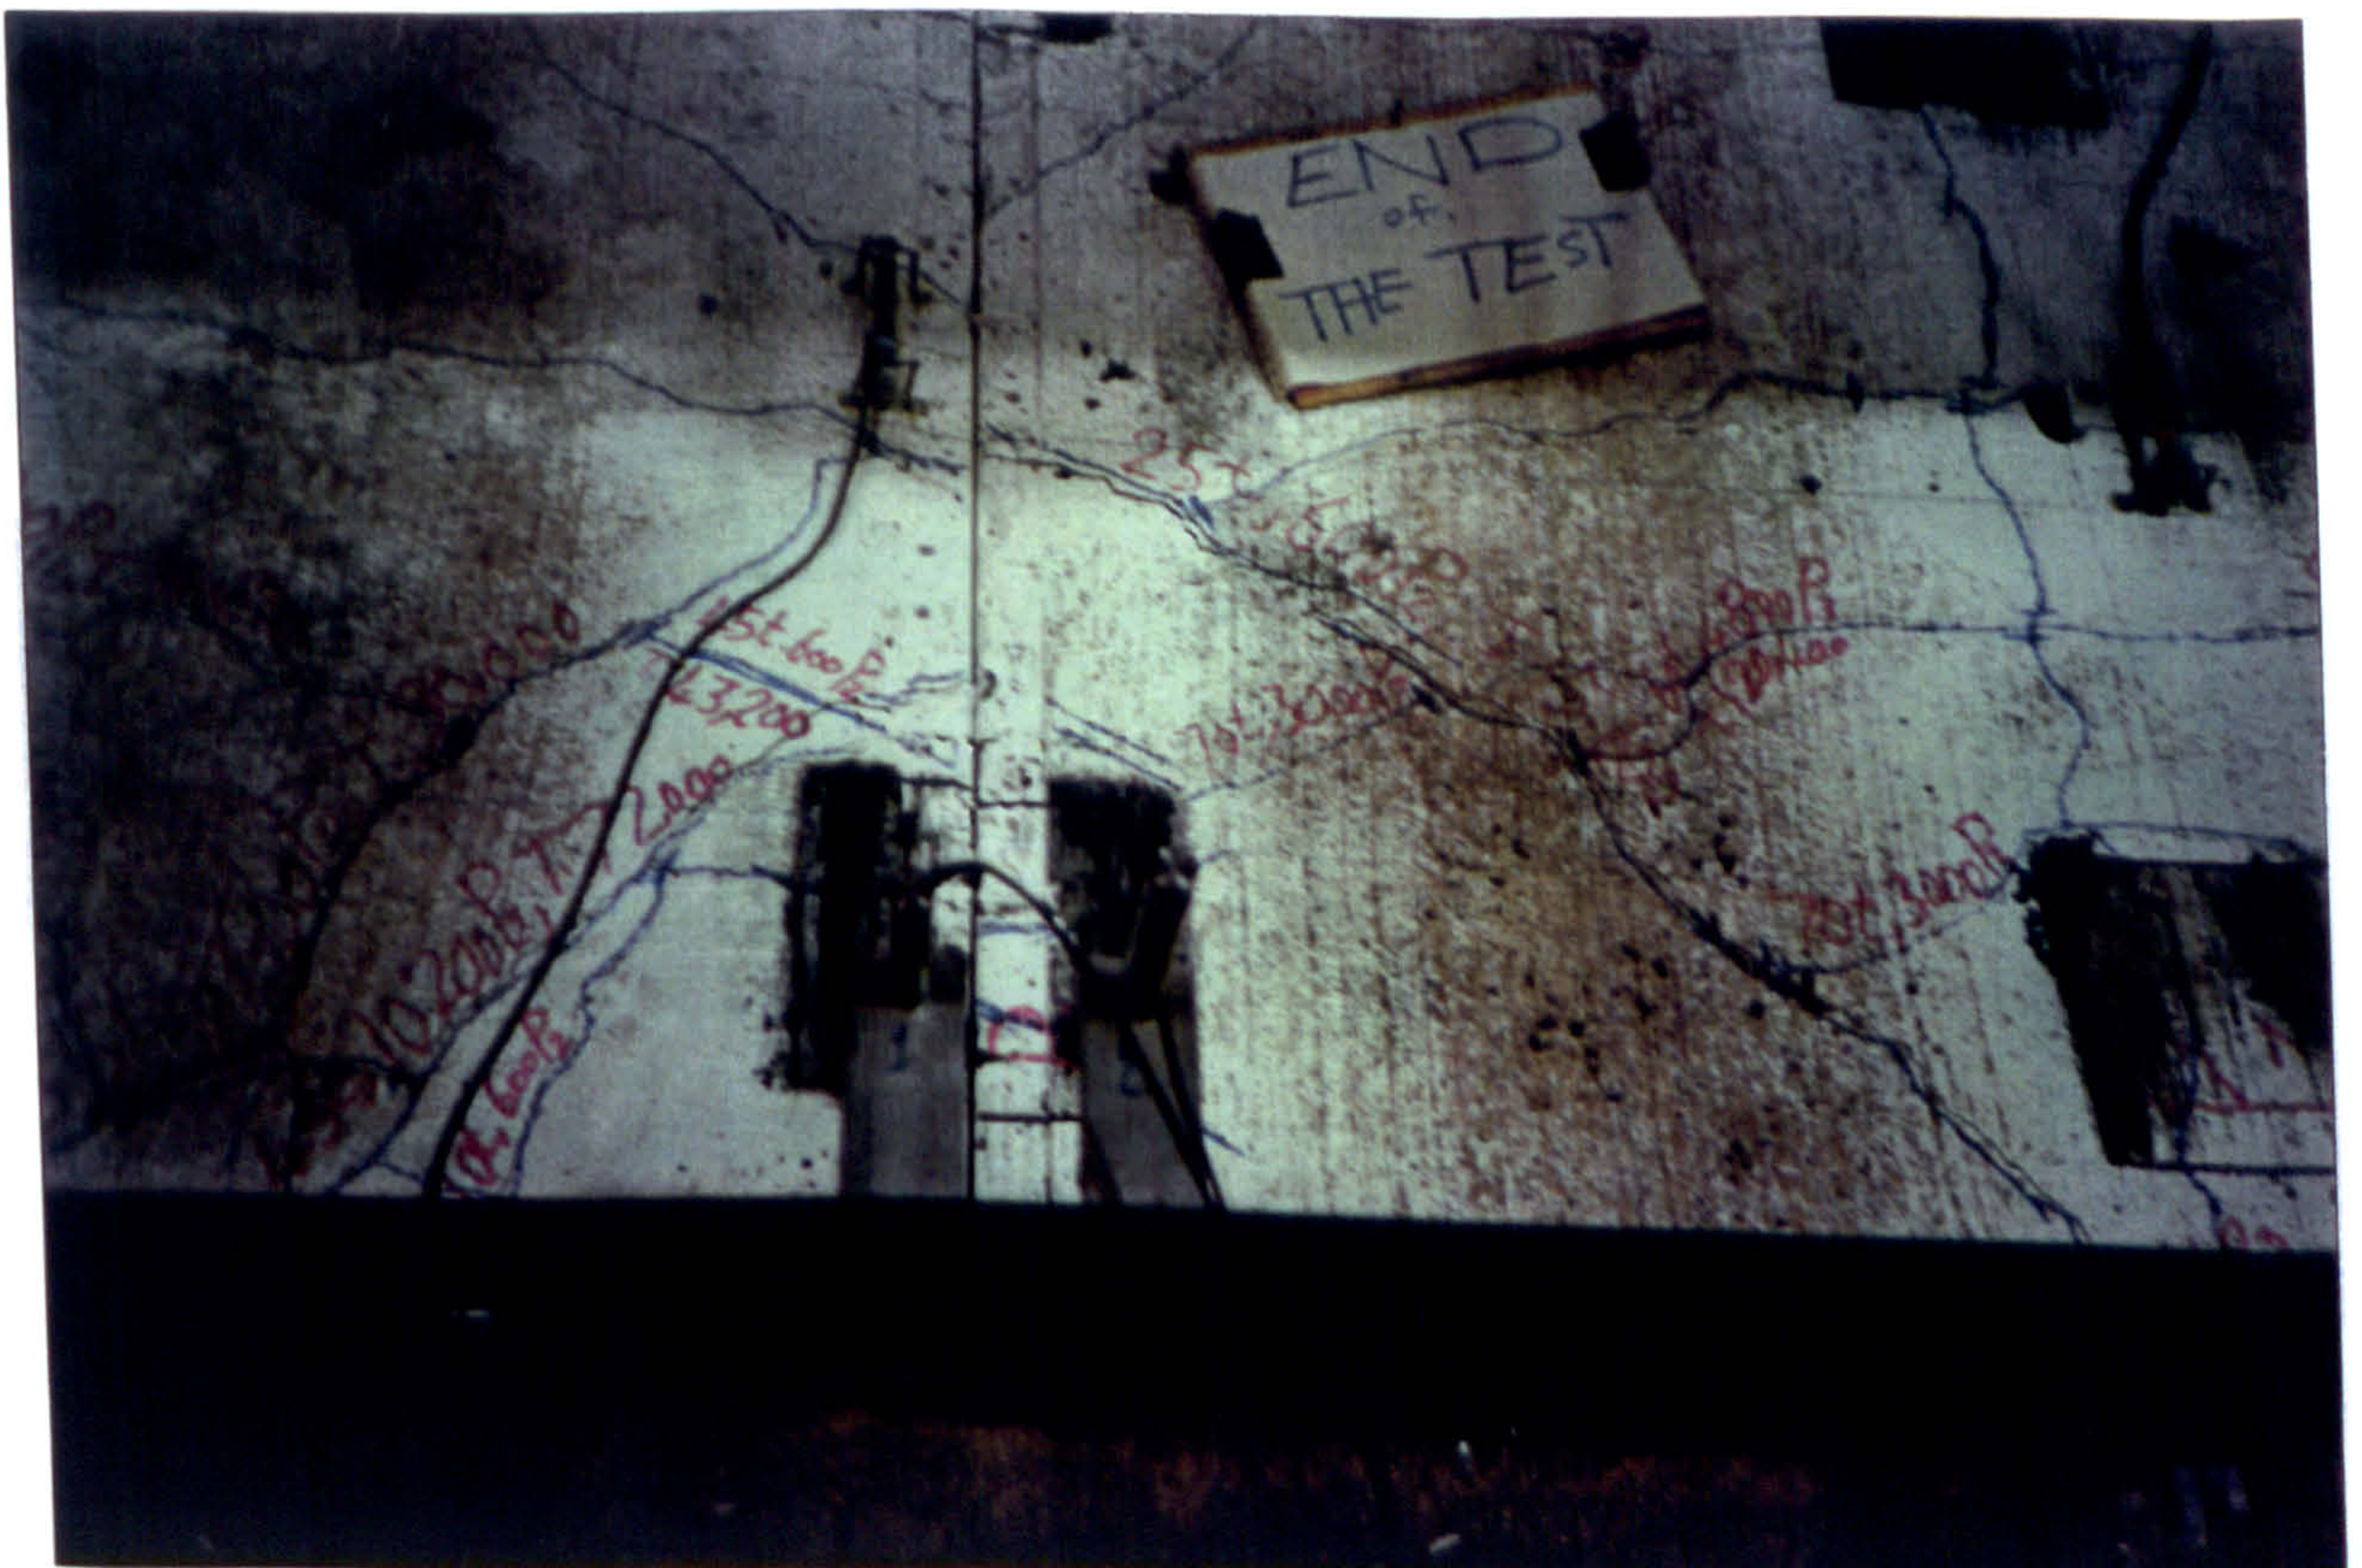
Falling of Small Concrete Pieces From a Cracked Section at Failure of P1 - Raft RS1
